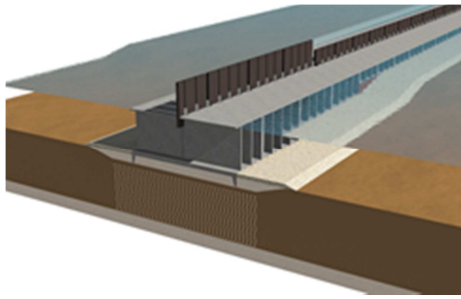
Birds eye sectional view of caisson barrier with vertical drain soil improvement (de Vries, 2014).
